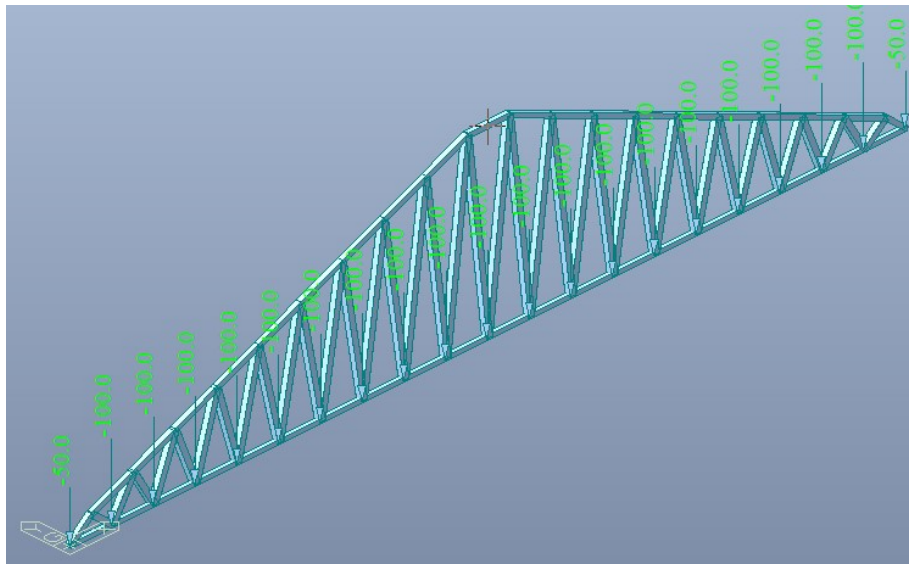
Model of the warren truss beam on Midas Gen®
